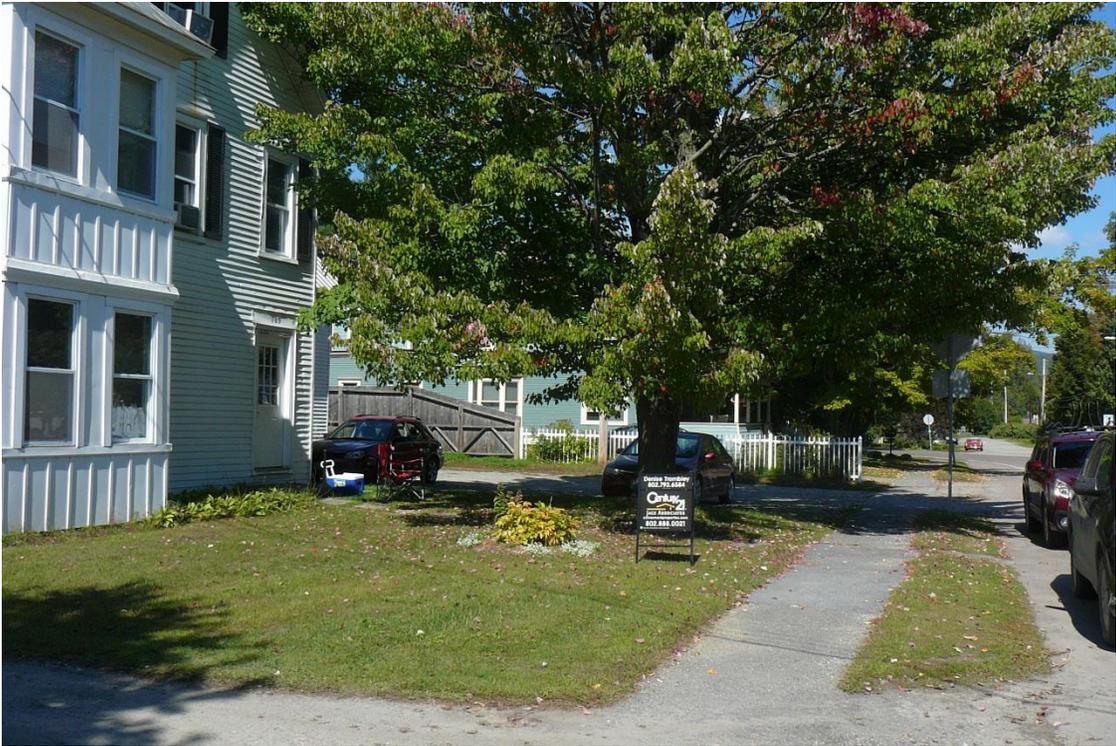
View north of existing sidewalk along the west side of Main Street in the northern portion of the study area; non-contributing building at left, NR building #38 in background.
